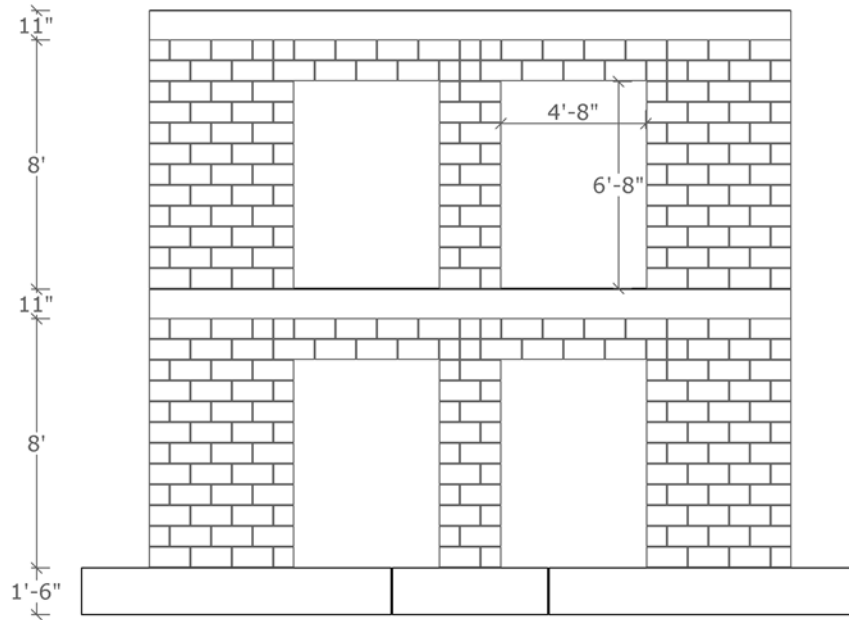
Elevation View of a Flange Wall. Mavros, M. 2013. Personal Communication. Used under fair use, 2014.
